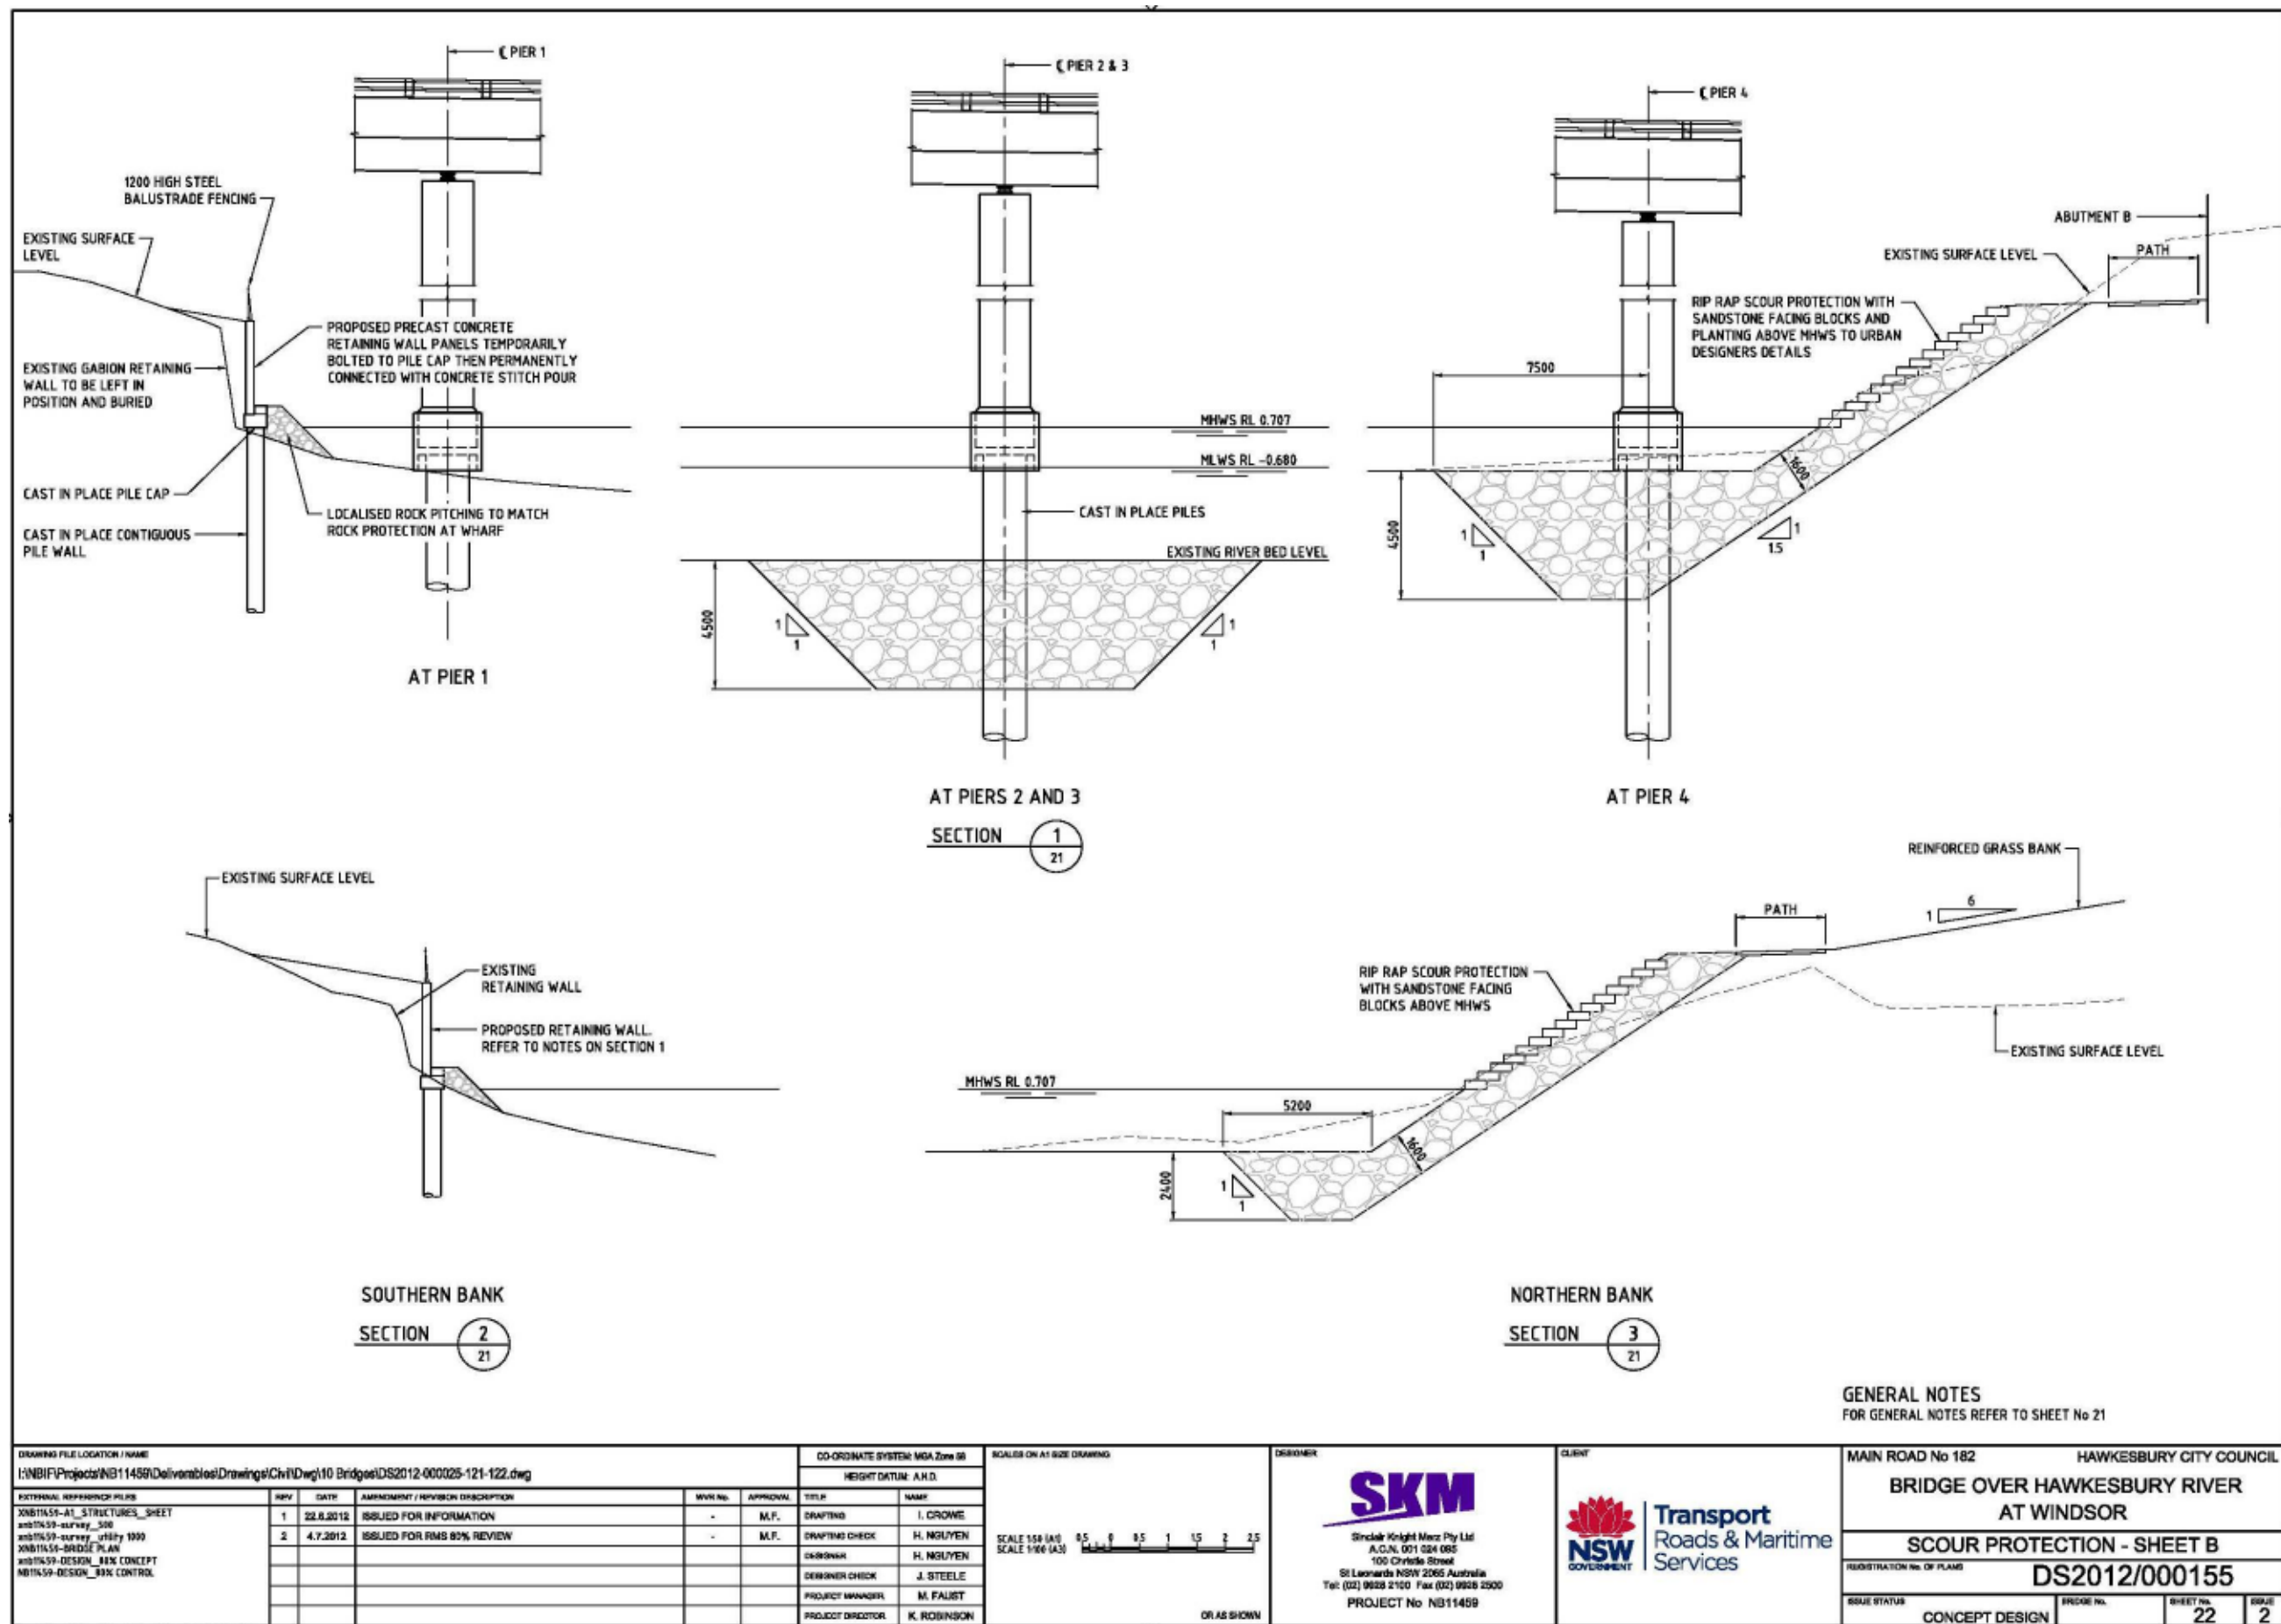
Design plan of the piers, rock armour scour protection and retaining walls. Note: The proposed retaining wall and rock protection is present on the two images on the left of the image. (Source: SKM).
